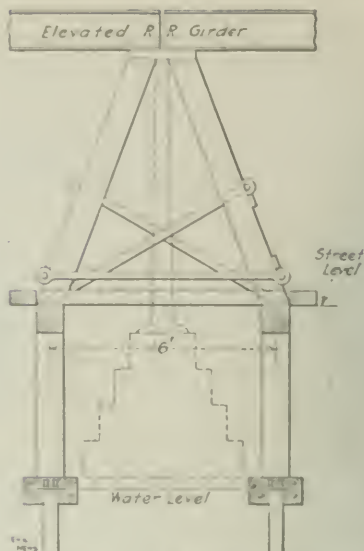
SUPPORT OF ELEVATED-RAILWAY COLUMNS ON CHURCH ST.
